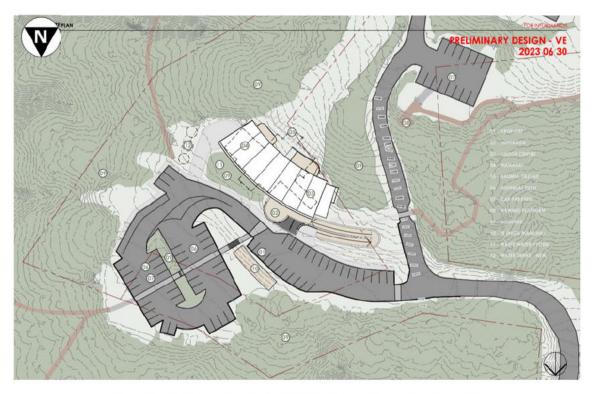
Preliminary layout plan (TOA Preliminary Design Drawings - VE)
